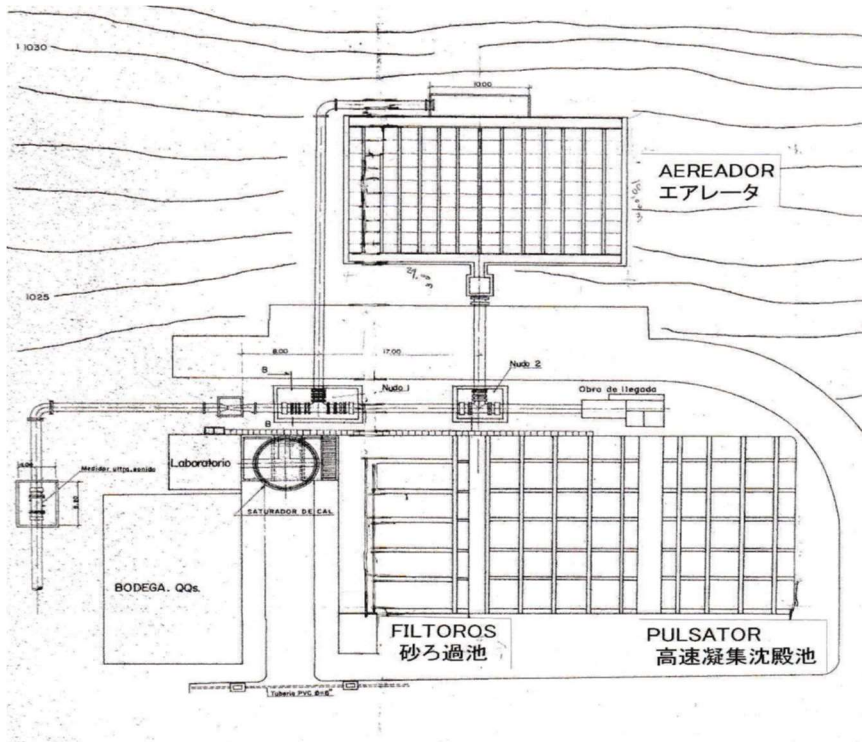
General Plan of Laureles Water Treatment Plant
